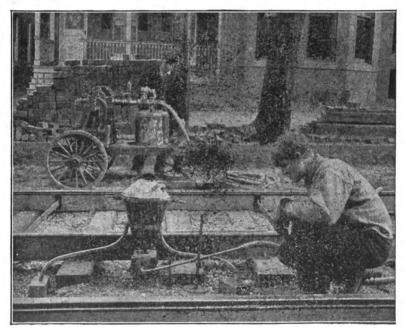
Preheating Steel Rail Prior to Forming Weld Courtesy of Goldschmidt Thermit Company
